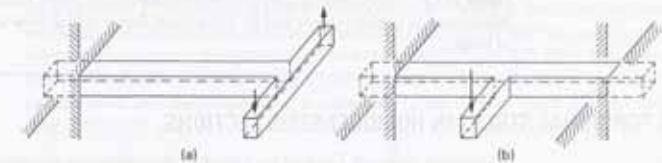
Reinforced concrete members subjected to torsion.
